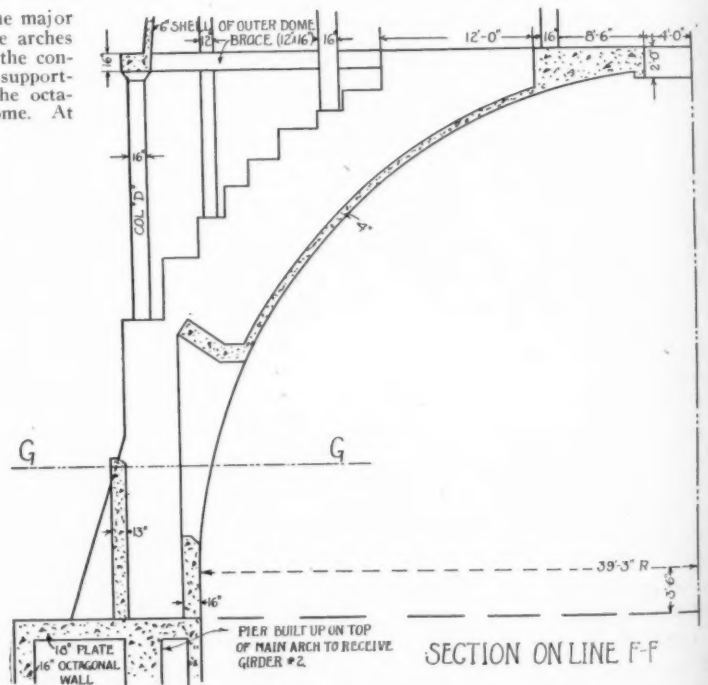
Section on line FF, Fig. 8, showing the arches or ribs supporting the four-inch reinforced concrete inner shell of the main dome and the columns which support the outer dome. These ribs rest on the 18-inch reinforced concrete plate shown at the top of sections shown in Figs. 4, 5 and 6. At F on key drawing, Fig. 1.
